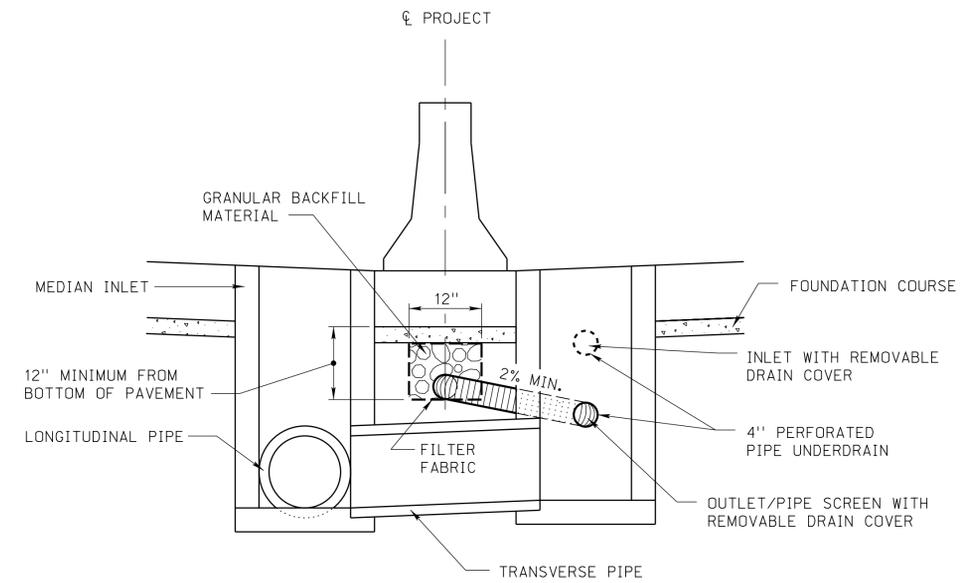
DETAILS OF PIPE UNDERDRAIN PLACEMENT
